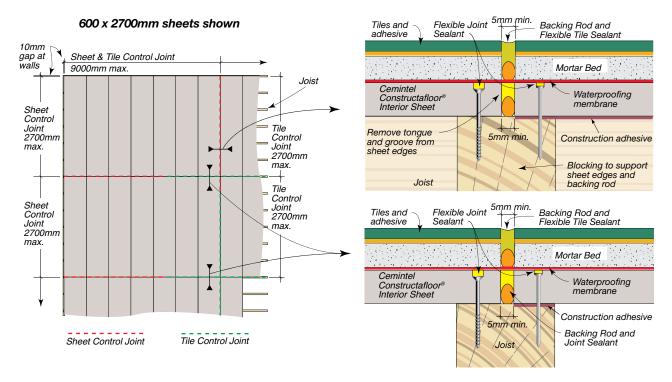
Typical Sheet & Control Joint Layout – Sheets Staggered & Mortar Bed System shown
